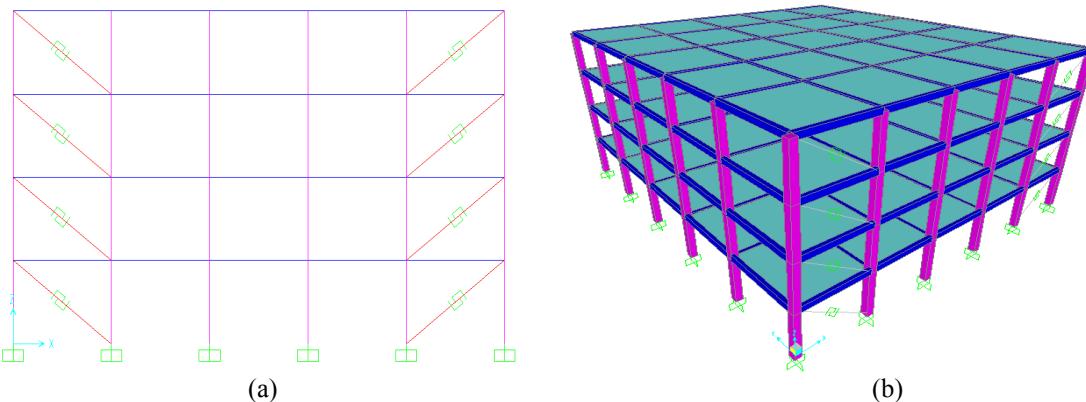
Elevation of building-2 with friction damper (b) Three Dimensional view of Building-2 with friction damper in the outer frames.
